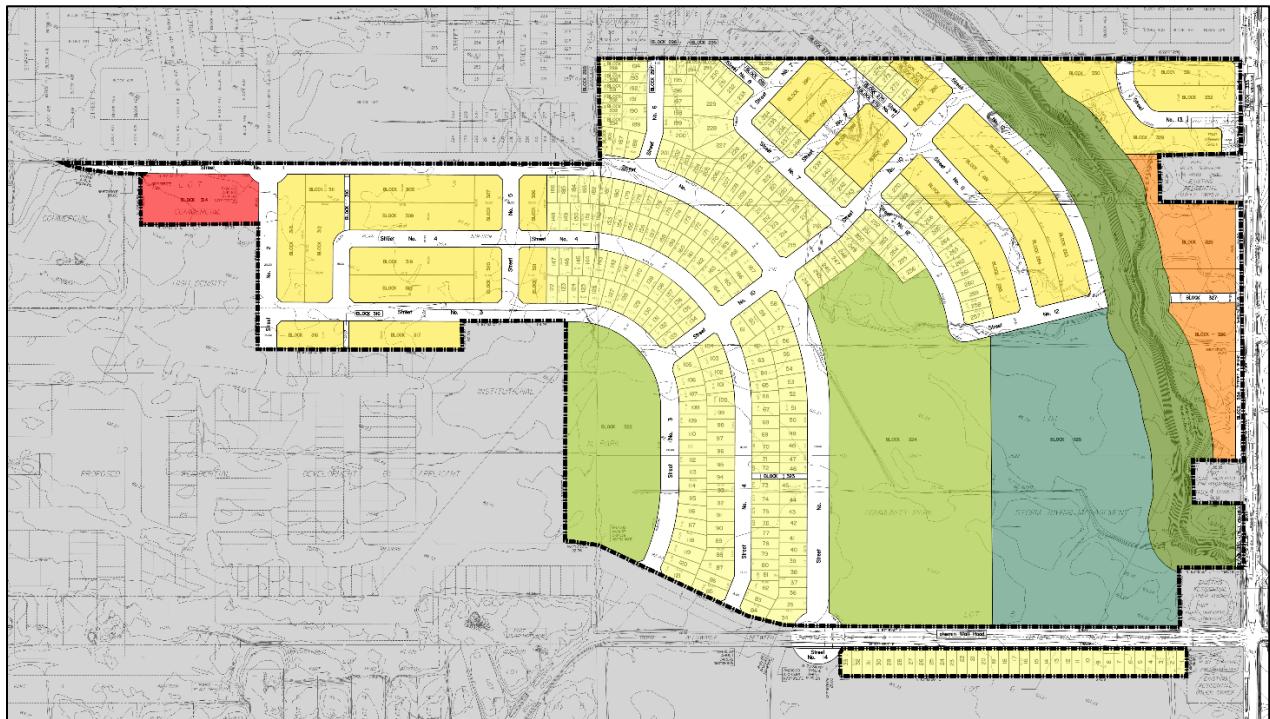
Coloured Excerpt of Proposed Draft Plan of Subdivision
